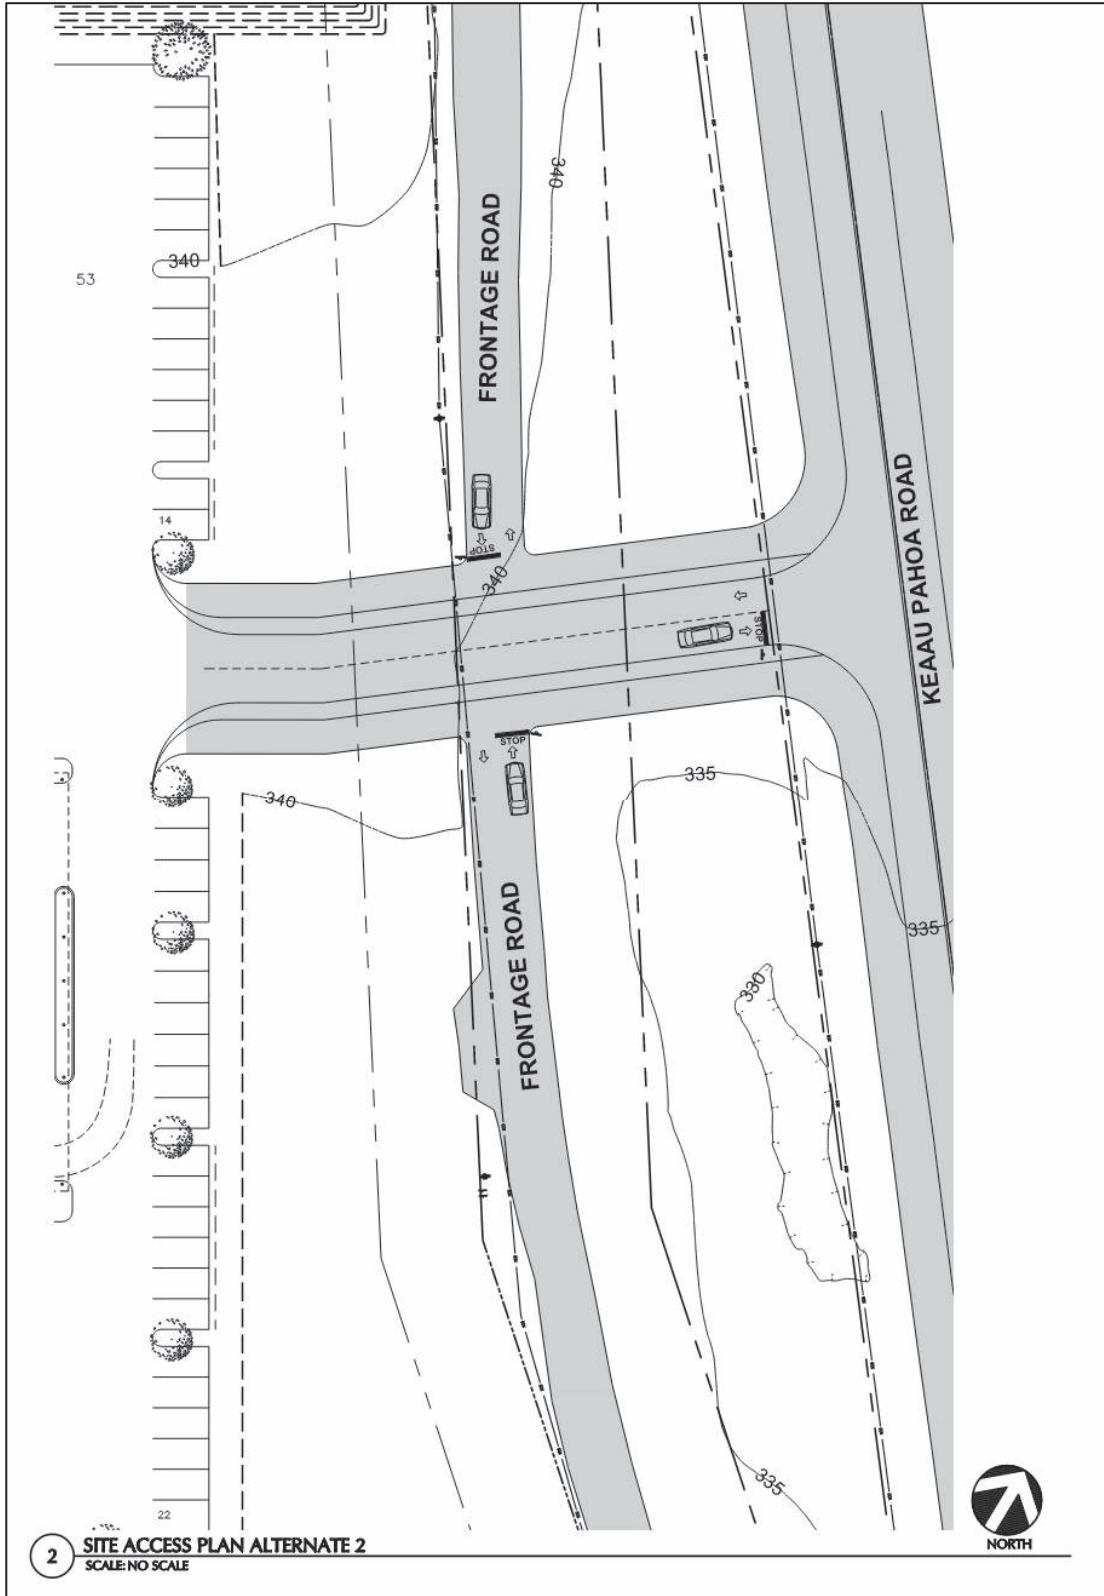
Alternative 2 Driveway Alignment with Connection to Old Kea'au-Pāhoa Road
